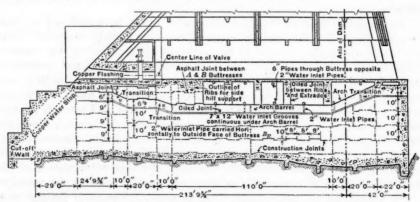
TYPICAL SECTION THROUGH BUTTRESS, RODRIGUEZ DAM.
